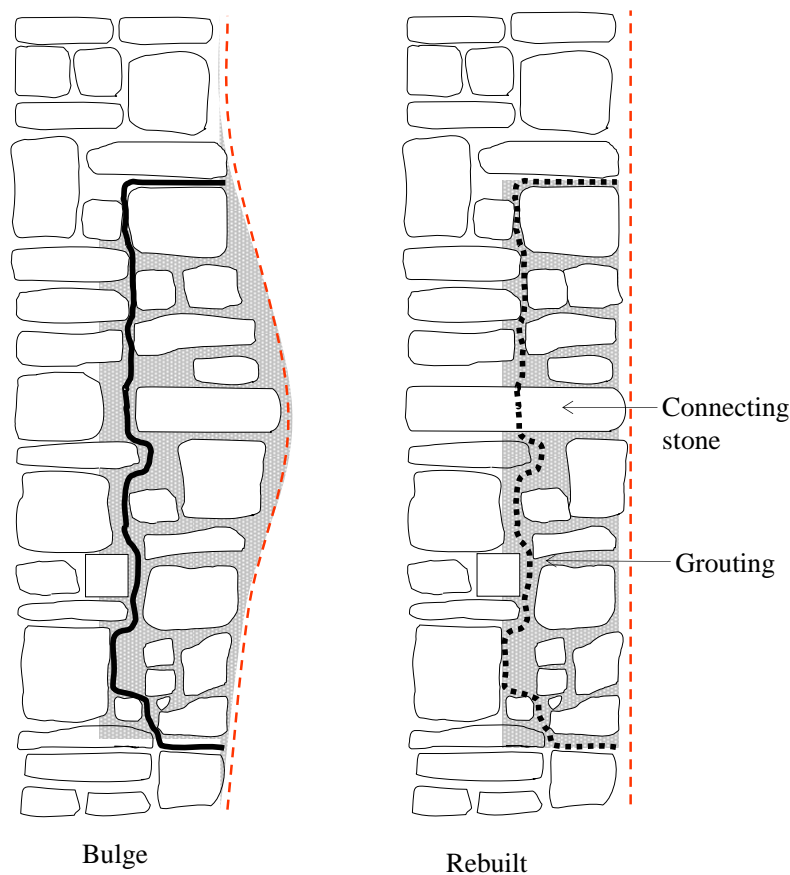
Reconstruction of wall (Tomazevic, 1999)
